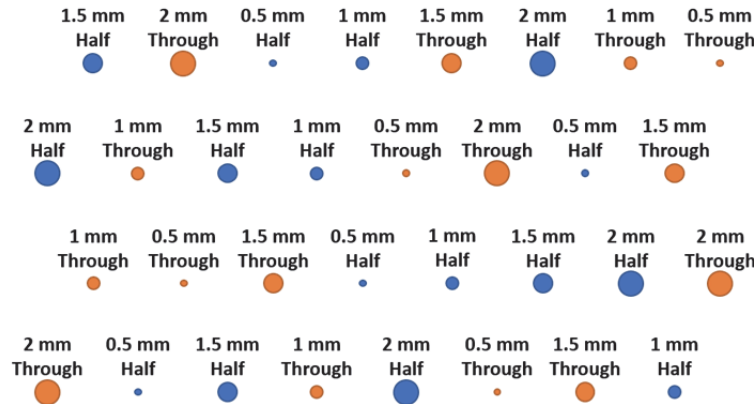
Arrangement of holes on the mock wall of 5/8" thick drywall.
